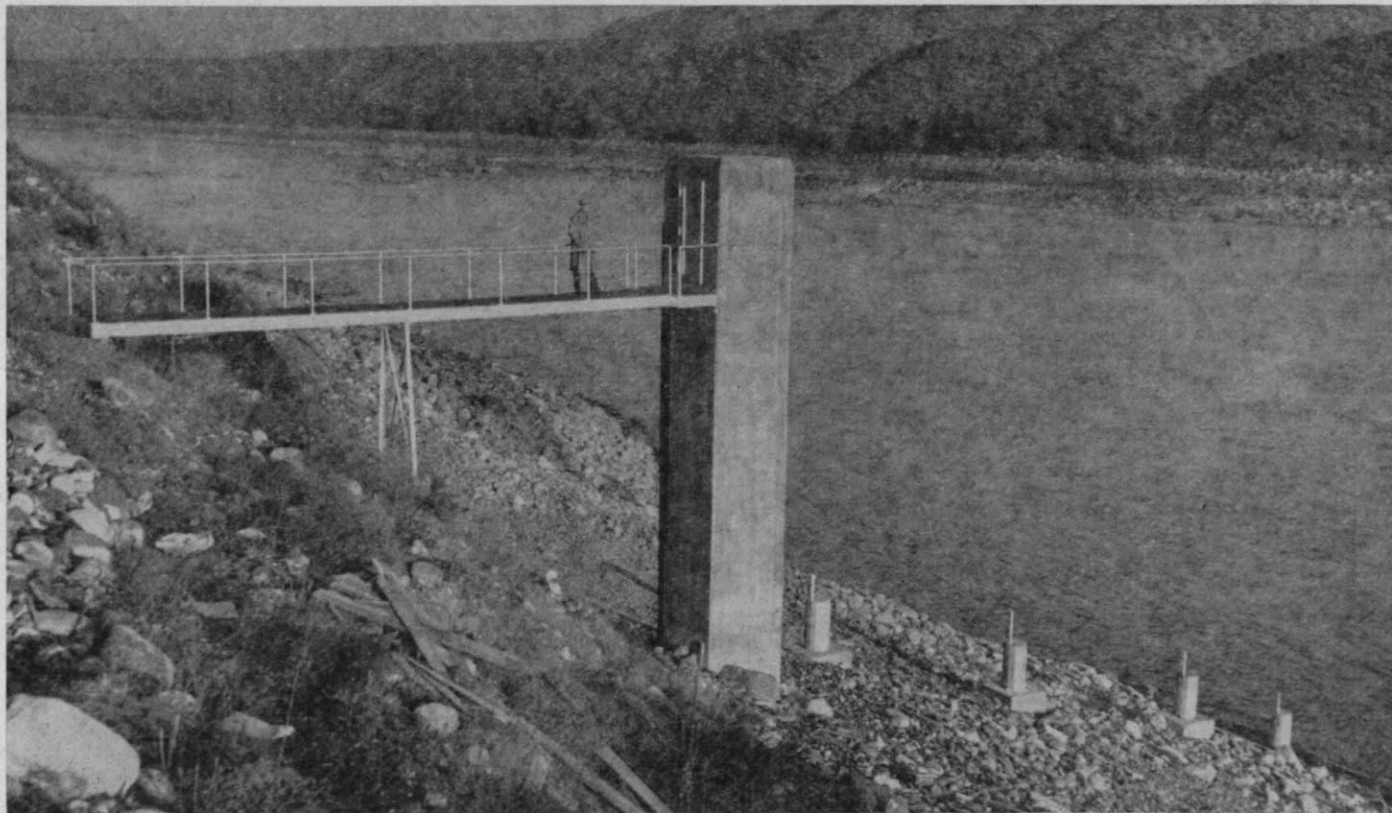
Concrete water-stage recorder structure, commonly called a "gage house and well," on Columbia River at Bridgeport. Note outside vertical staff reference gage in several sections.
